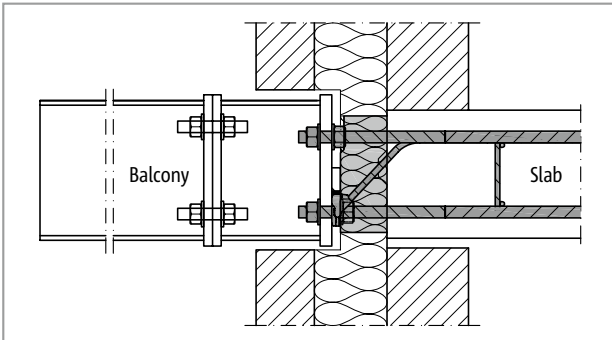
Schöck Isokorb® T type SK: Insulating element inside the core insulation; stub bracket between the Isokorb® and the balcony to enable flexible installation.
